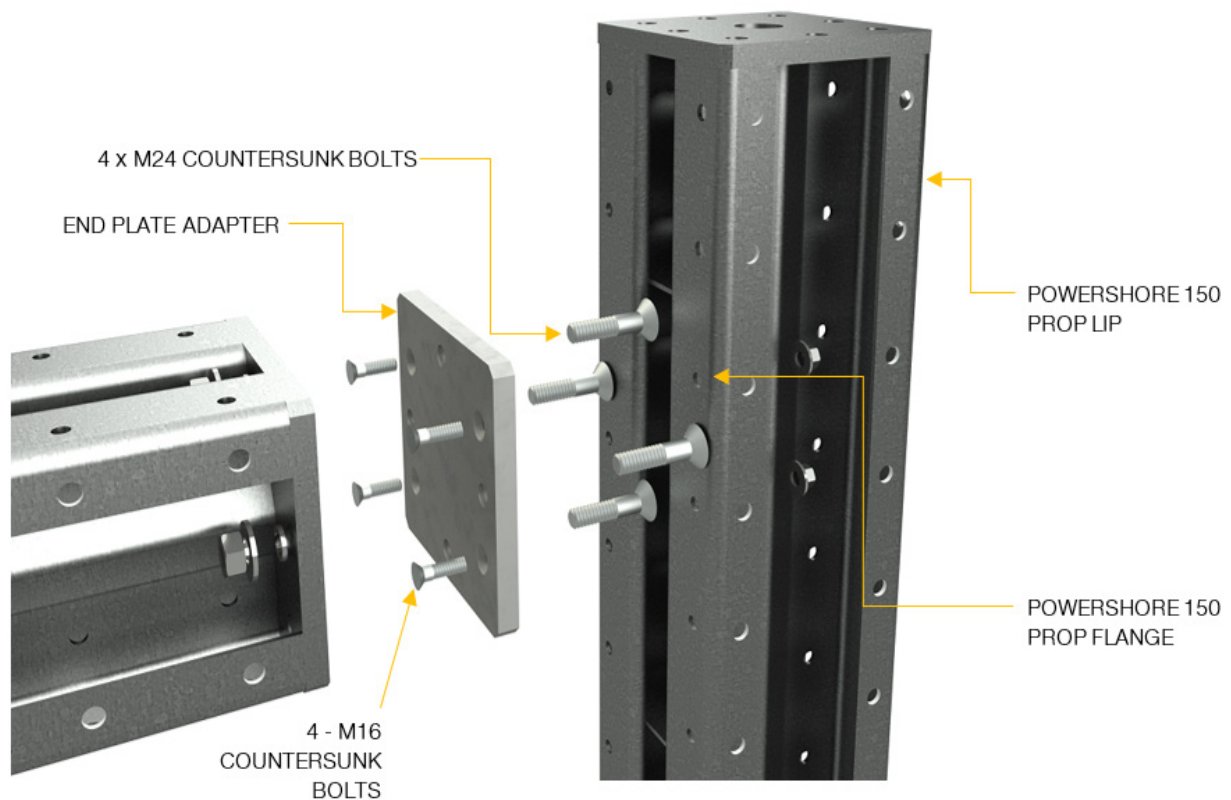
DETAILED VIEW OF BOLT CONNECTION TO POWERSHORE 150 PROP LIP
